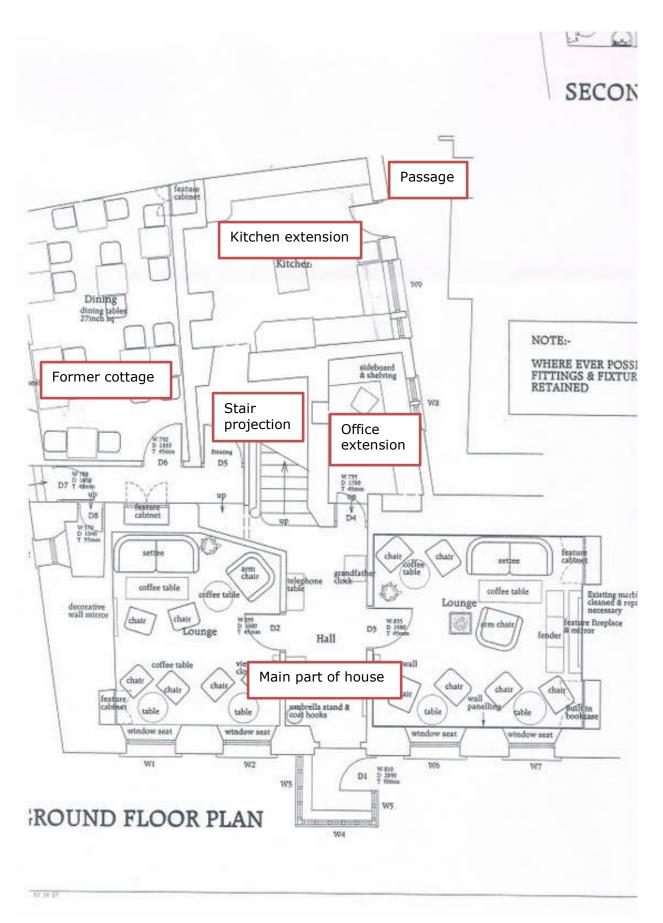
Ground floor plan as existing (not to scale), showing former cottage, main part of house, stair projection, kitchen extension and office extension.
